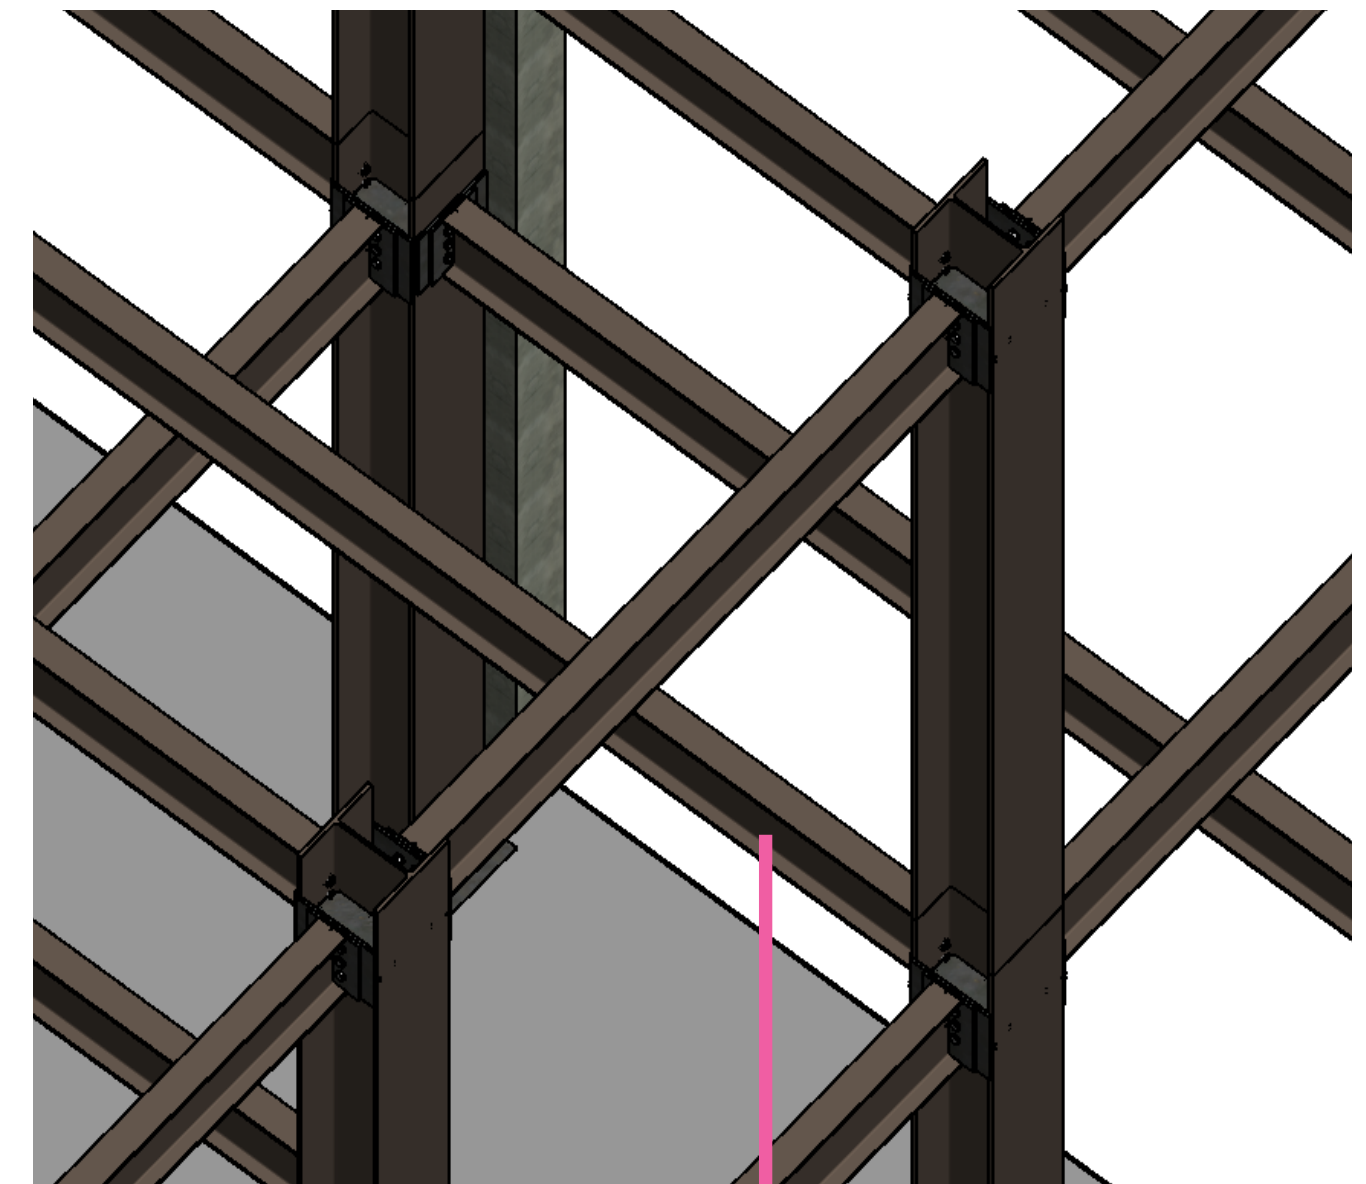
Connection Between Beams and Columns (Beeley, 2020).
